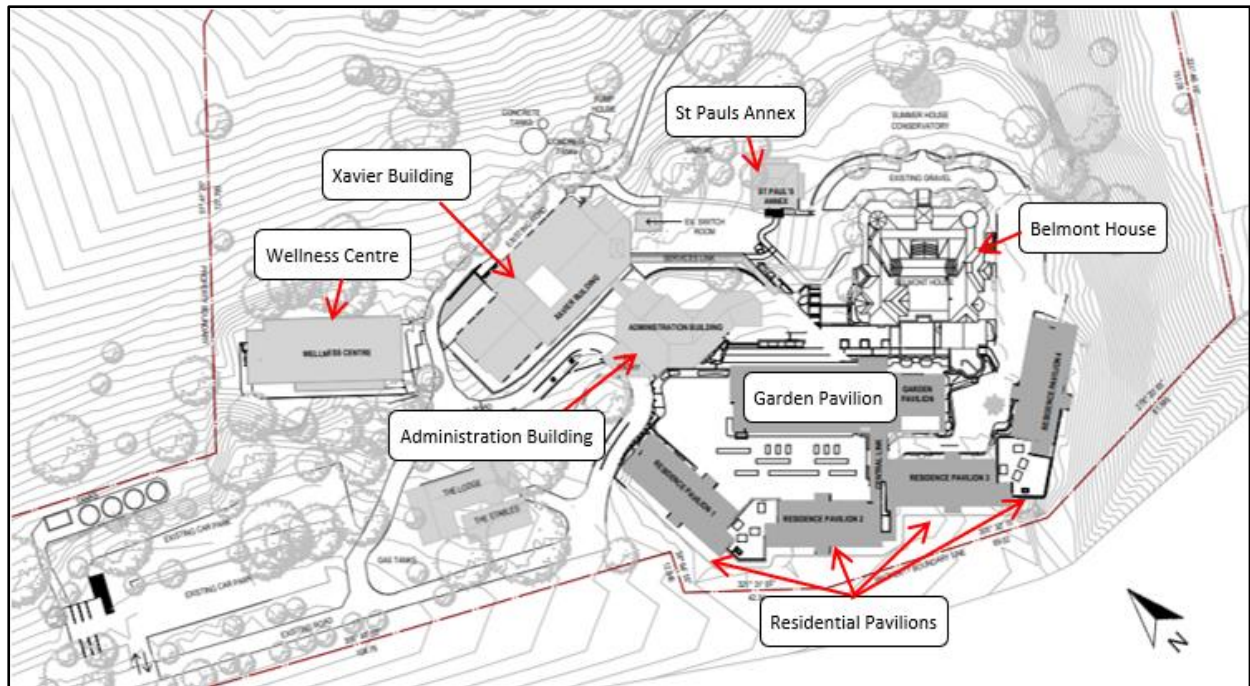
| Proposed site layout (Source: Applicant's RFI response)
